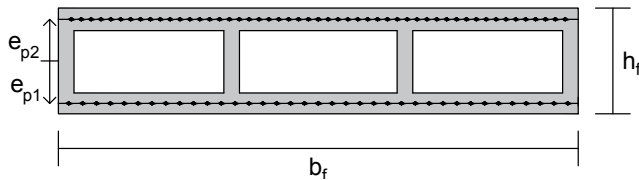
Prestress configuration in the open floor element in x-direction
